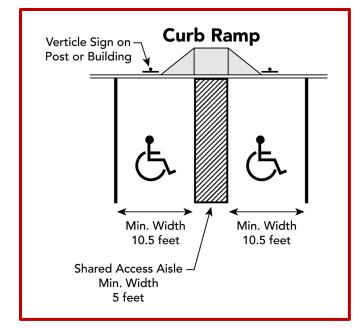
Accessible Parking Stall and Walk Aisleway Dimensions
